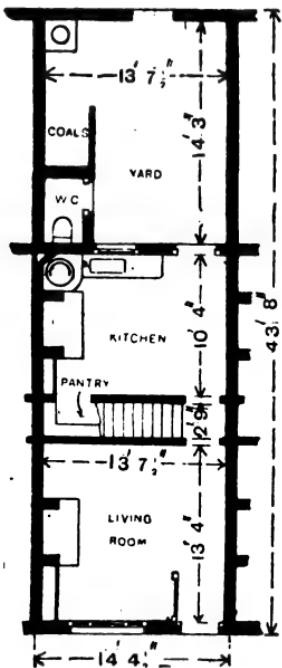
Ground Plan of 14-ft. 4-in. House.
